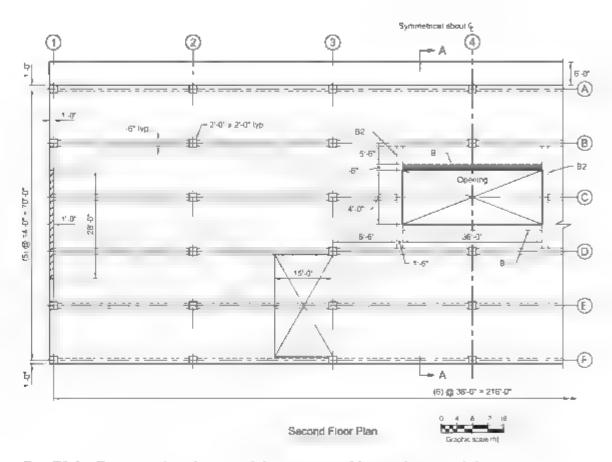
1-Framing plan showing slab opening and beams framing slab opening
